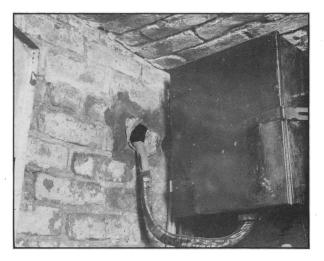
OPEN CONDUIT CARRYING ELECTRIC CABLE AND ENTERING BUILDING THROUGH BASEMENT WALL.
